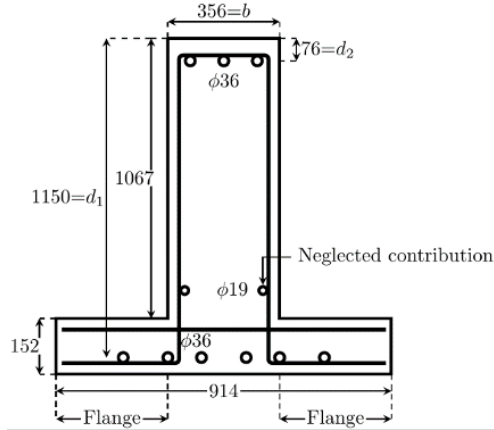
Cross-sectional details of inverted-T beams (unit: mm).
